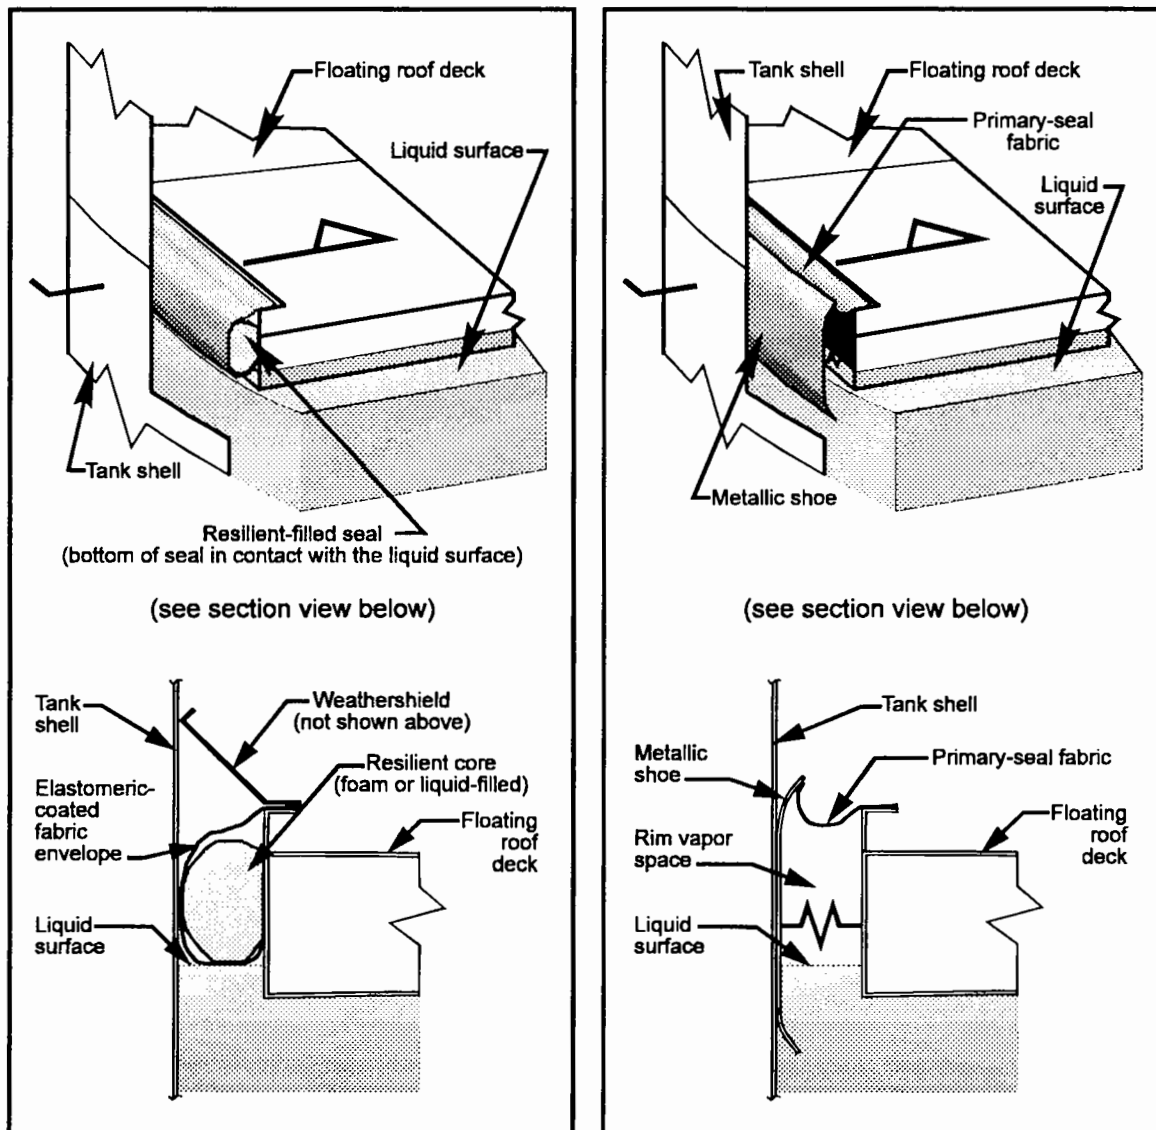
Liquid-mounted and mechanical shoe primary seals.²¹
